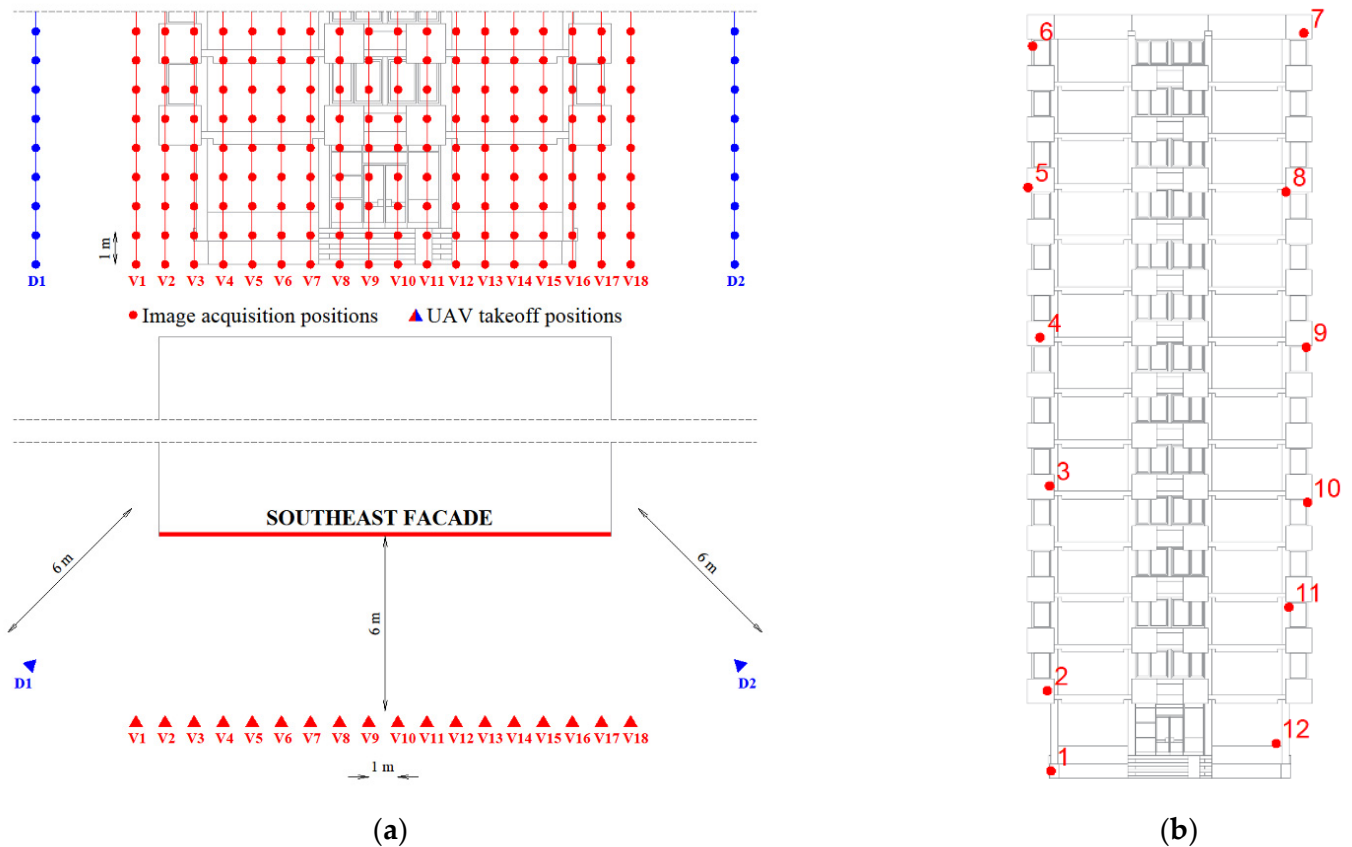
Southeast building façade. (a) Flight scheme with image acquisition positions and UAV take-off positions; (b) locations of the surveyed control points on the façade.
